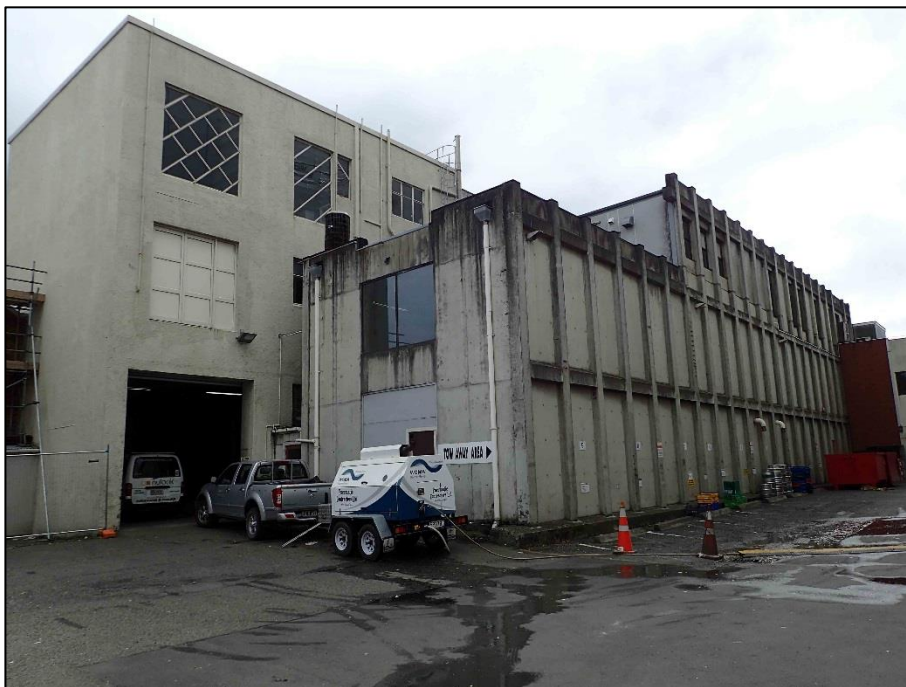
Photograph of the east elevation, looking northwest. Note that the 1981 extension obscures the east elevation of the 1909 building, with only the 1981 and 1954 extensions visible.
